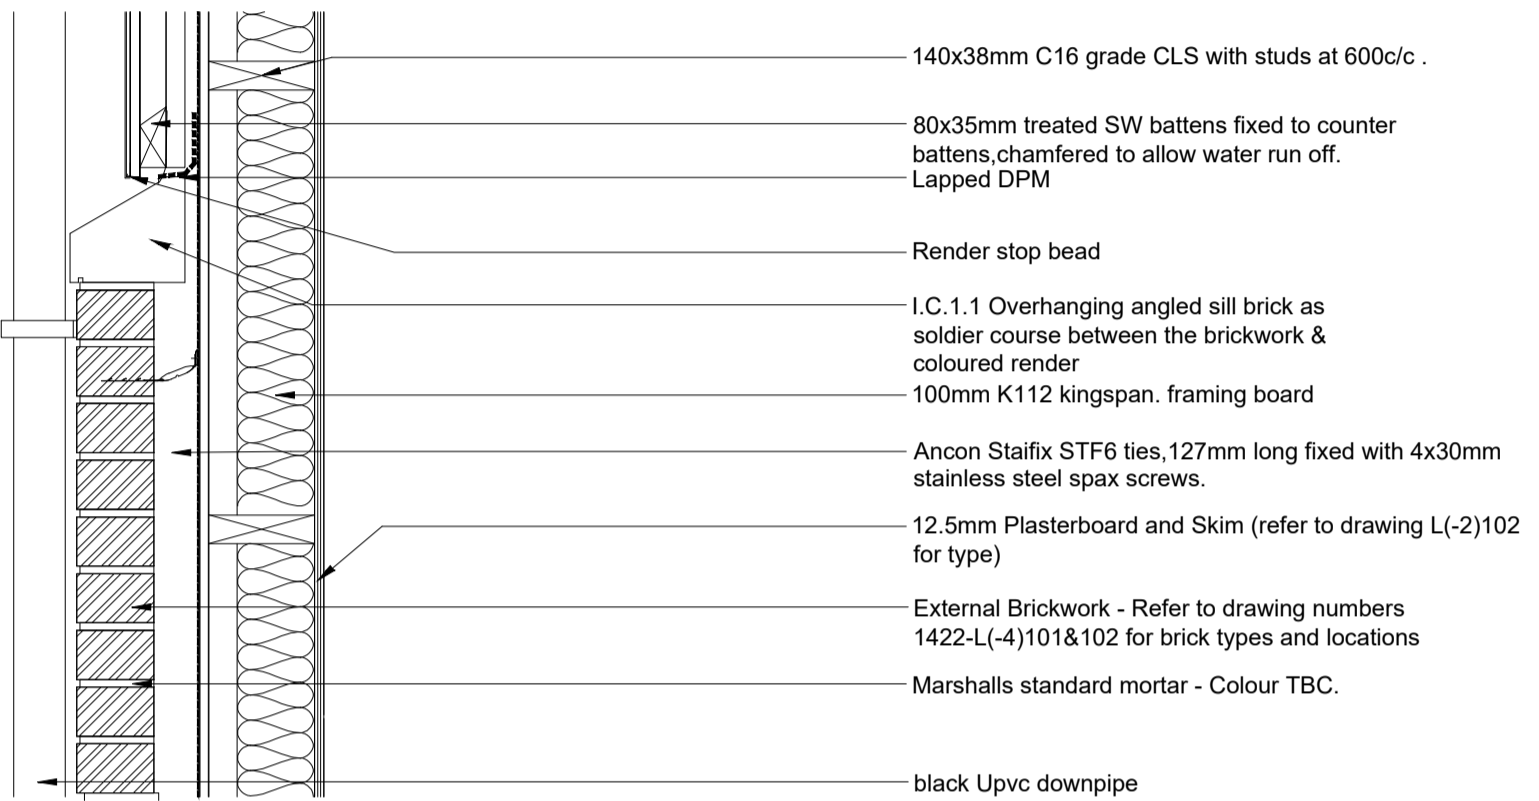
Detail A - Typical Glazing/Door Head, Warm Roof and Brick External Finish
